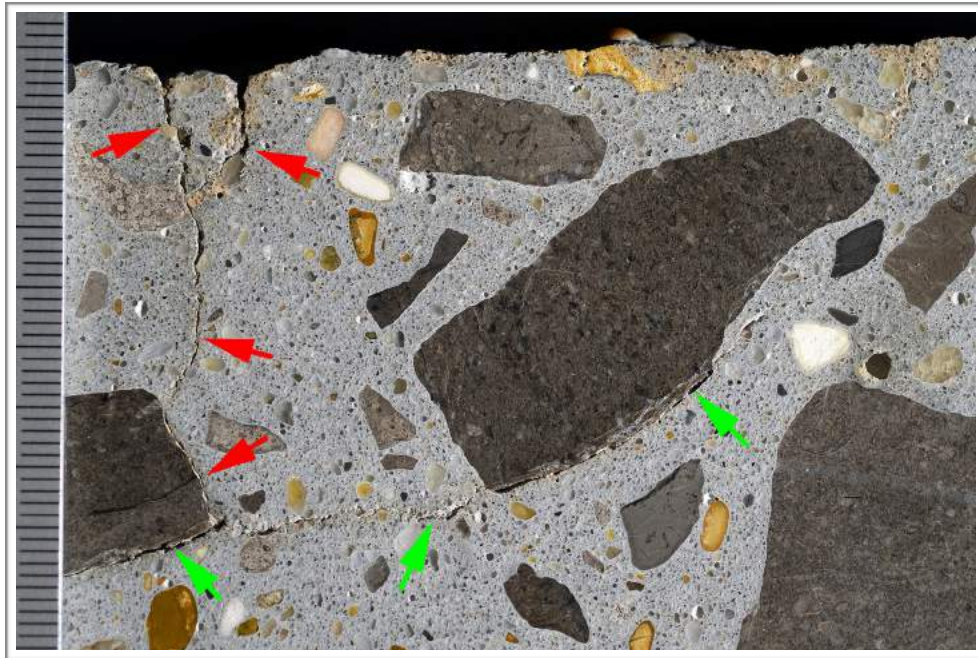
Photograph of polished surface showing sub-vertical crack (red arrows) at the top of the core and the sub-horizontal crack (green arrows) where it terminates.
